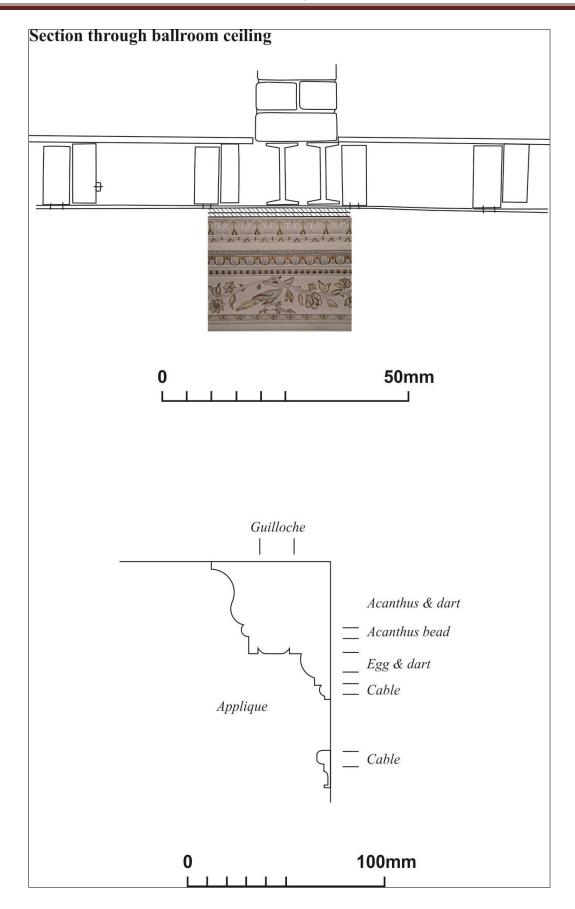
Cross section through the entire ceiling with a section of the cornice superimposed; also cornice cross-section, affixed directly to the plaster.
